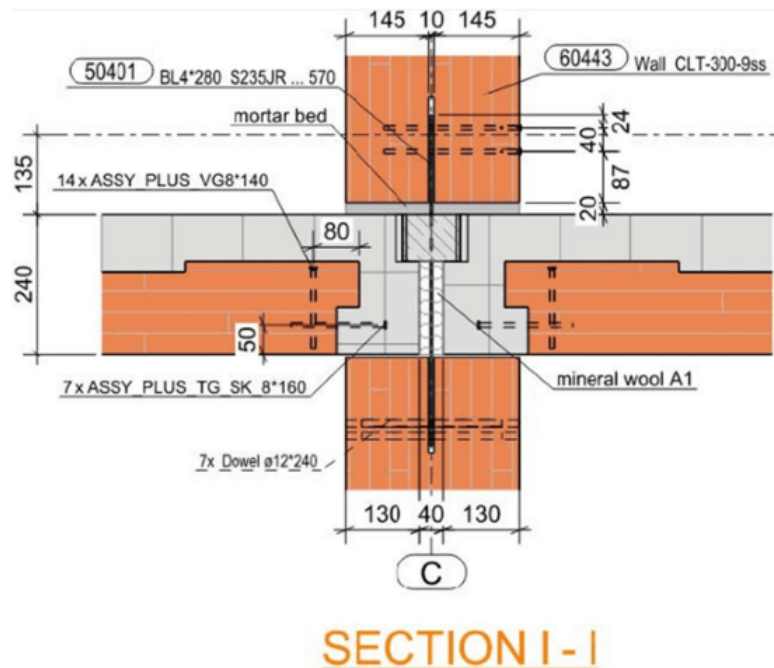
Detailing of a typical wall-to-floor connection [57]
